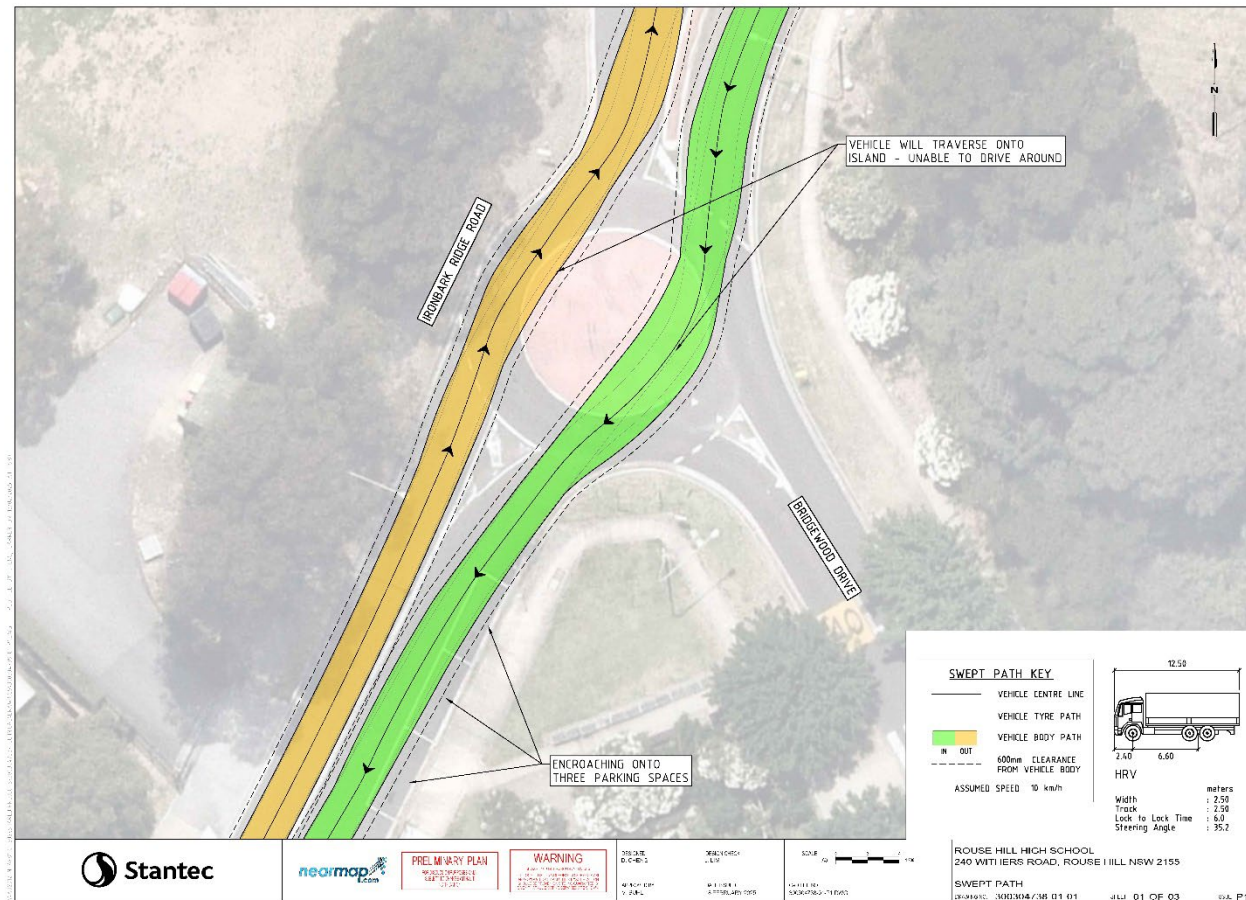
Construction heavy vehicle swept paths at Ironbark Ridge Road / Bridgewood Drive roundabout
